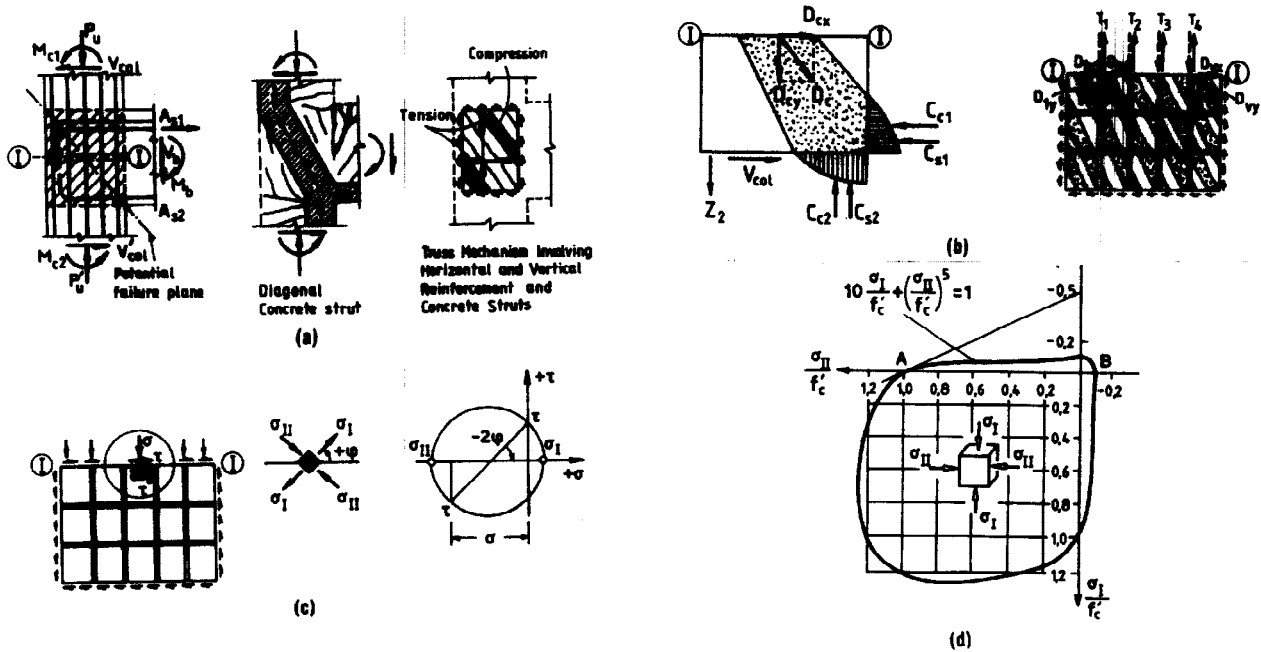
(a) External beam-column connection and the two mechanisms of shear transfer, (b) Forces acting in the joint core concrete through section I-I from the two mechanisms, (c) Stress state of element of this studied region, (d) Representation of concrete biaxial strength curve by a parabola of 5th degree
